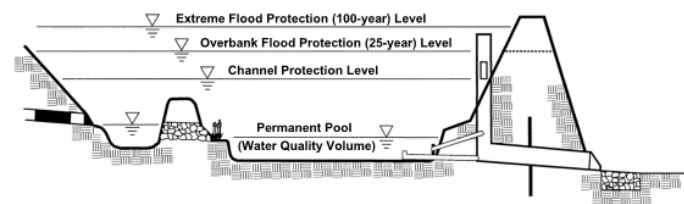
Unified Sizing Criteria Water Surface Elevations in a Stormwater (Wet) Pond
